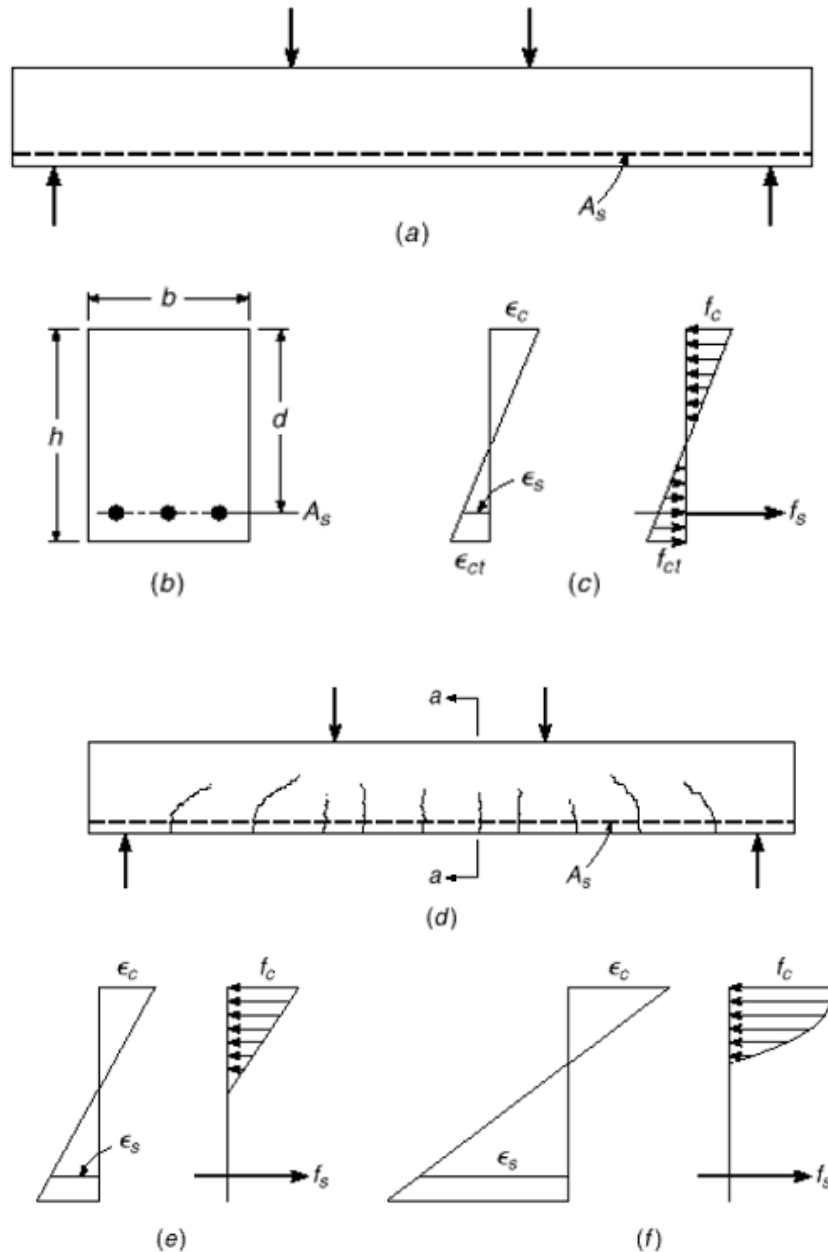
Behavior of reinforced concrete beam under increasing load (Arthur, H. Nilson, 2004).
